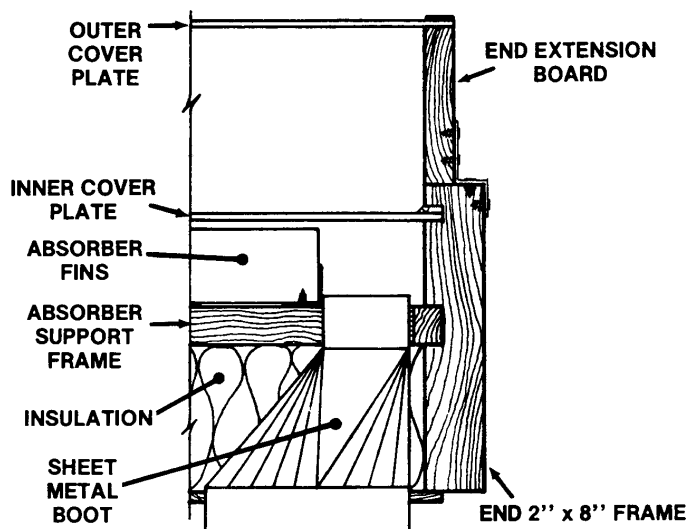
SHEET METAL BOOT AND END ATTACHMENT
